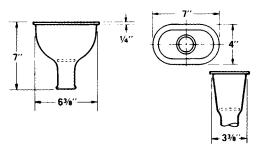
Beaded Outlet 3- by 6-in. Oval
